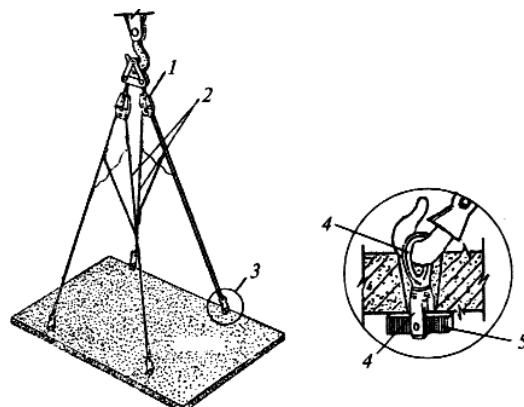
Slinging of the floor panel: 1 - universal traverse; 2 - stocking branch with an equalizing rope; 3 - inventory gripping loops; 4 - loop; 5 - rocker-capture
